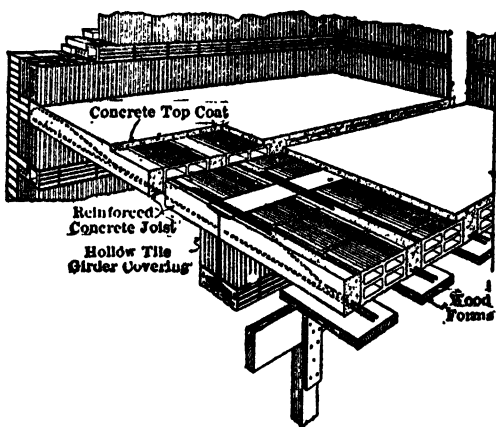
Terra Cotta Blocks Alternating with Concrete Ribs
